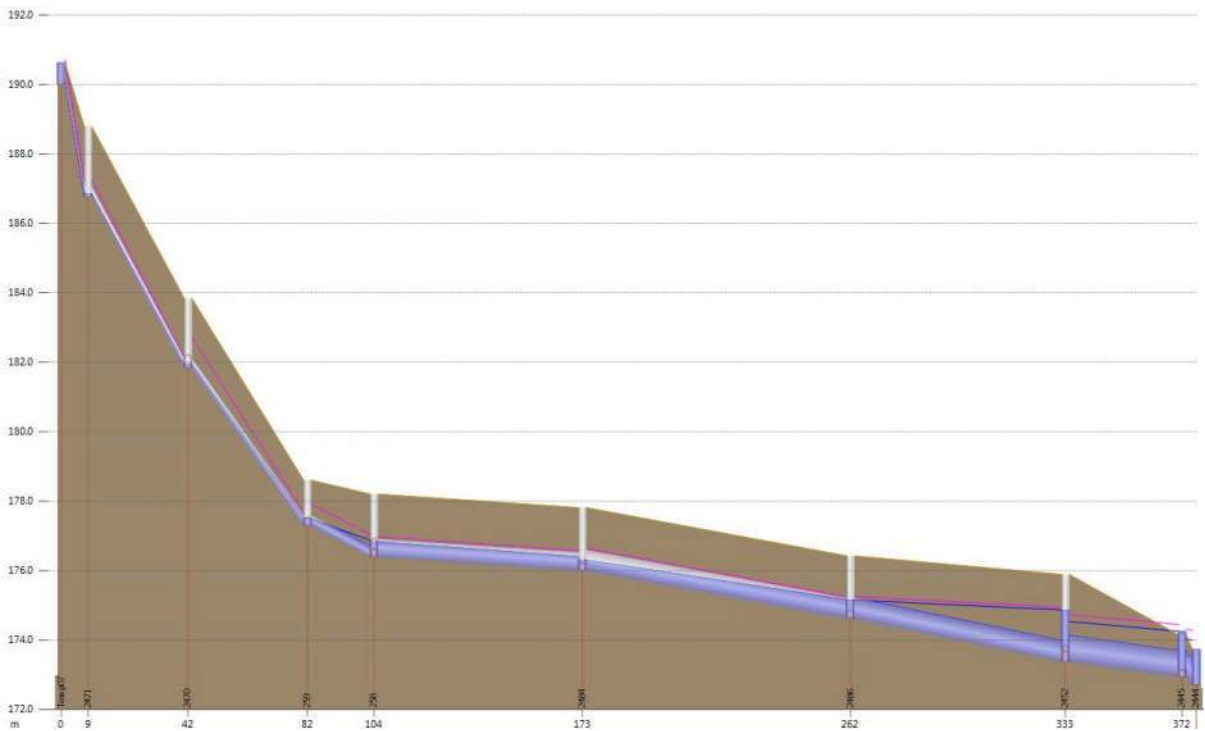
20 yr 1 hr Long section from top of Classic Drive to outlet headwall (pre-development)
